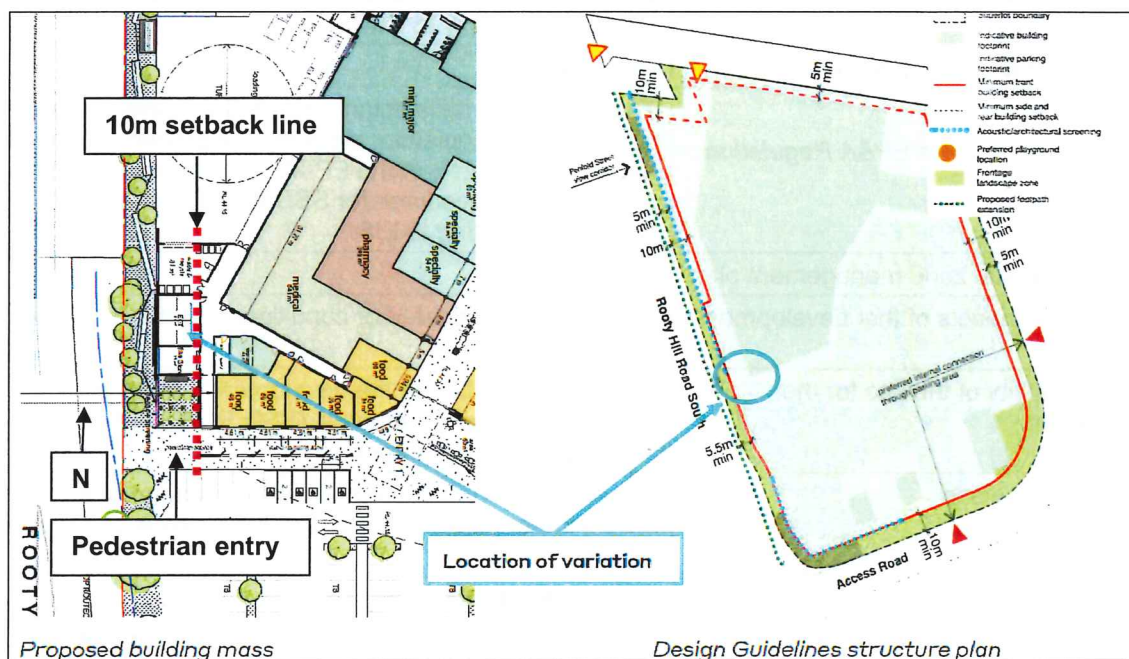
Proposed building (left) and approved envelope (right) (source: Applicant's RtS)
